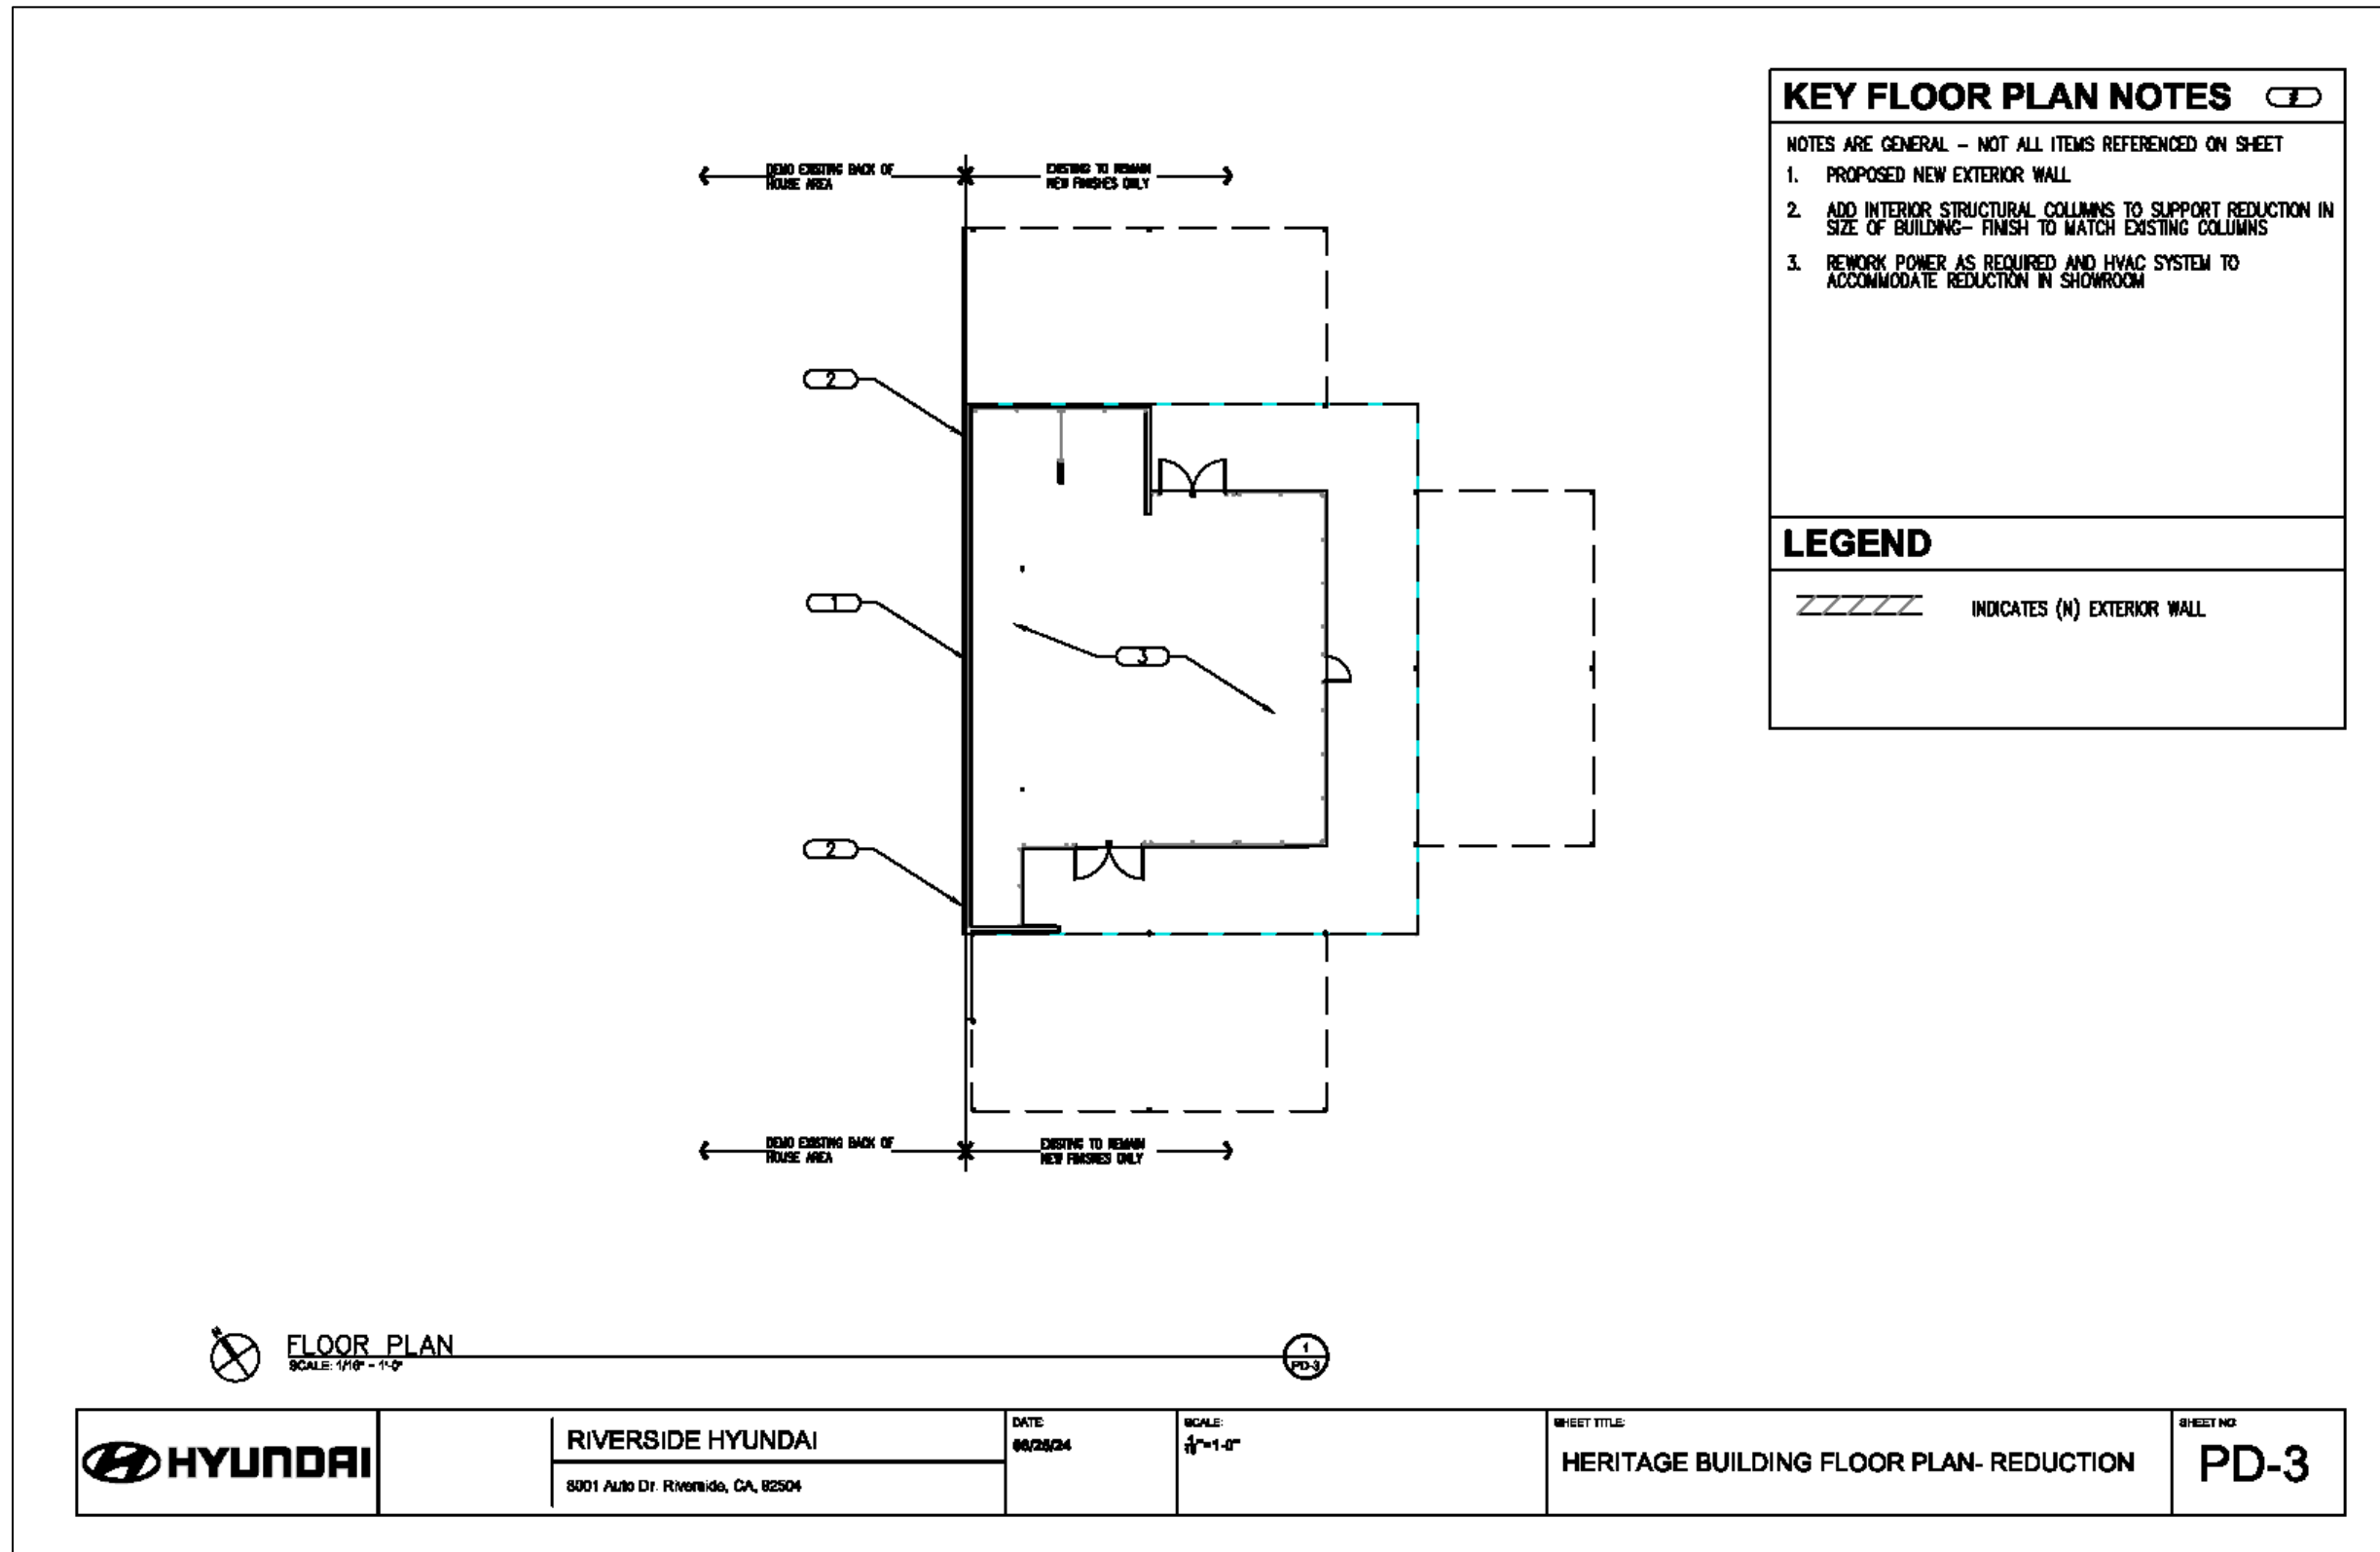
Floor plan view of the proposed Project (Provided by Mike Khoury).
